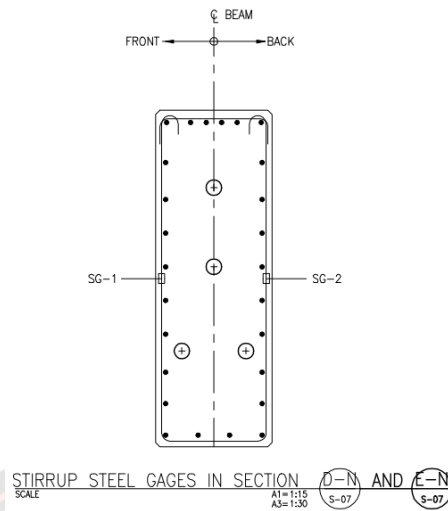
Sectional detail of steel strain gauges (vertical steel bars)
